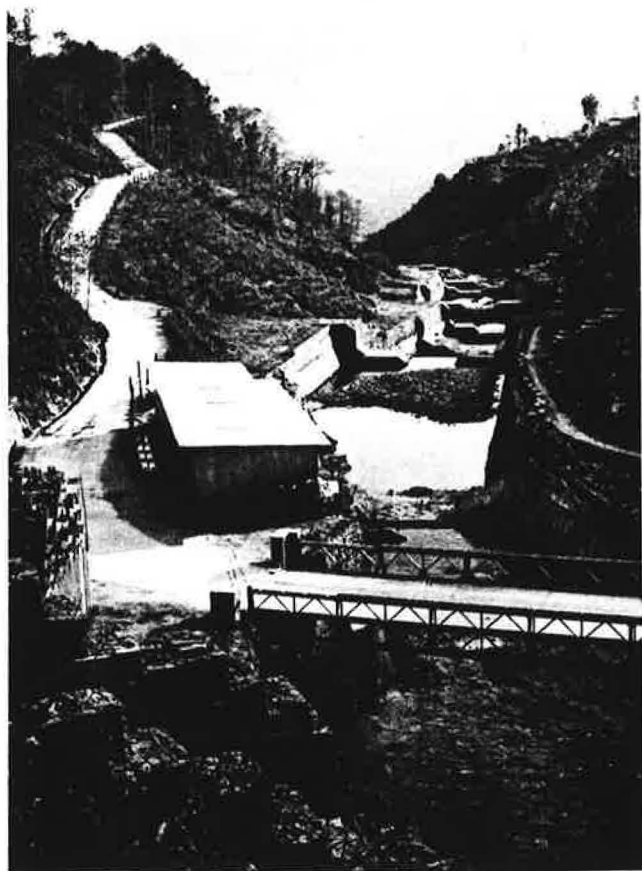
New Charnawati bridge crossing. The store in the foreground is used for current construction work.
